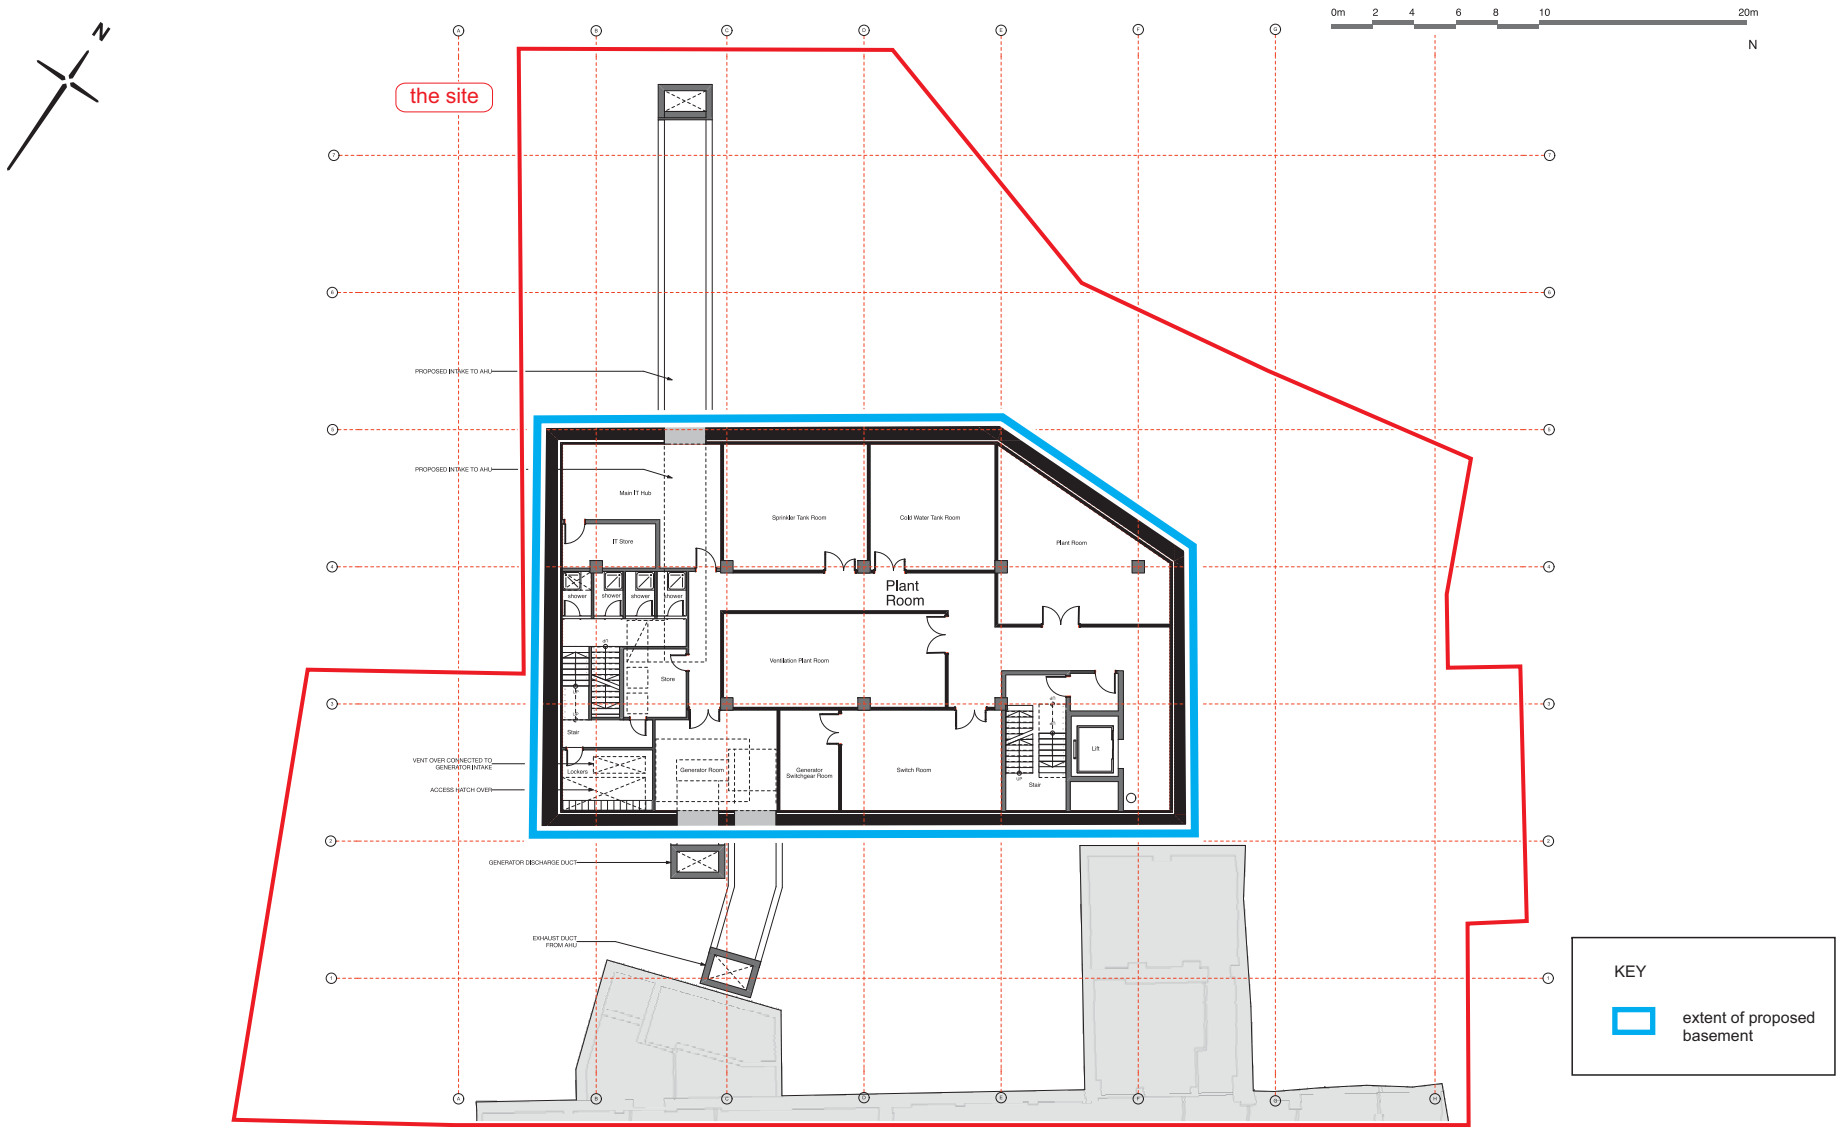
Plan of proposed basement level 1 (BMJ Architects, Drwg No 2924/AW10 PL(00)22, October 2017, Rev D)
